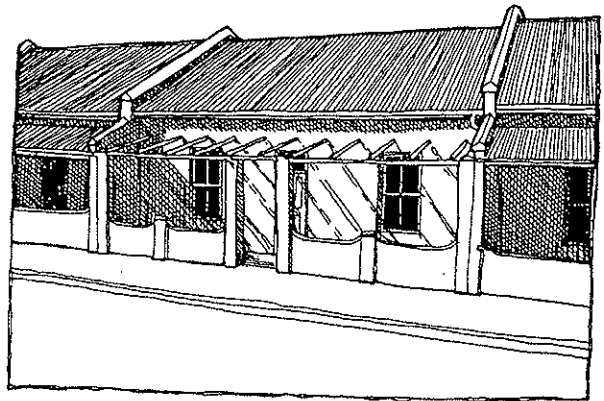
Replacing the verandah roof with a pergola disturbs the pattern of light and shade along the street.
